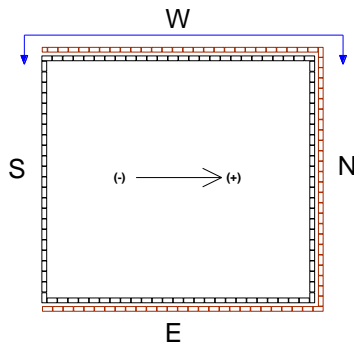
West elevation of the specimen Clay outer leaf. Units of cm.
